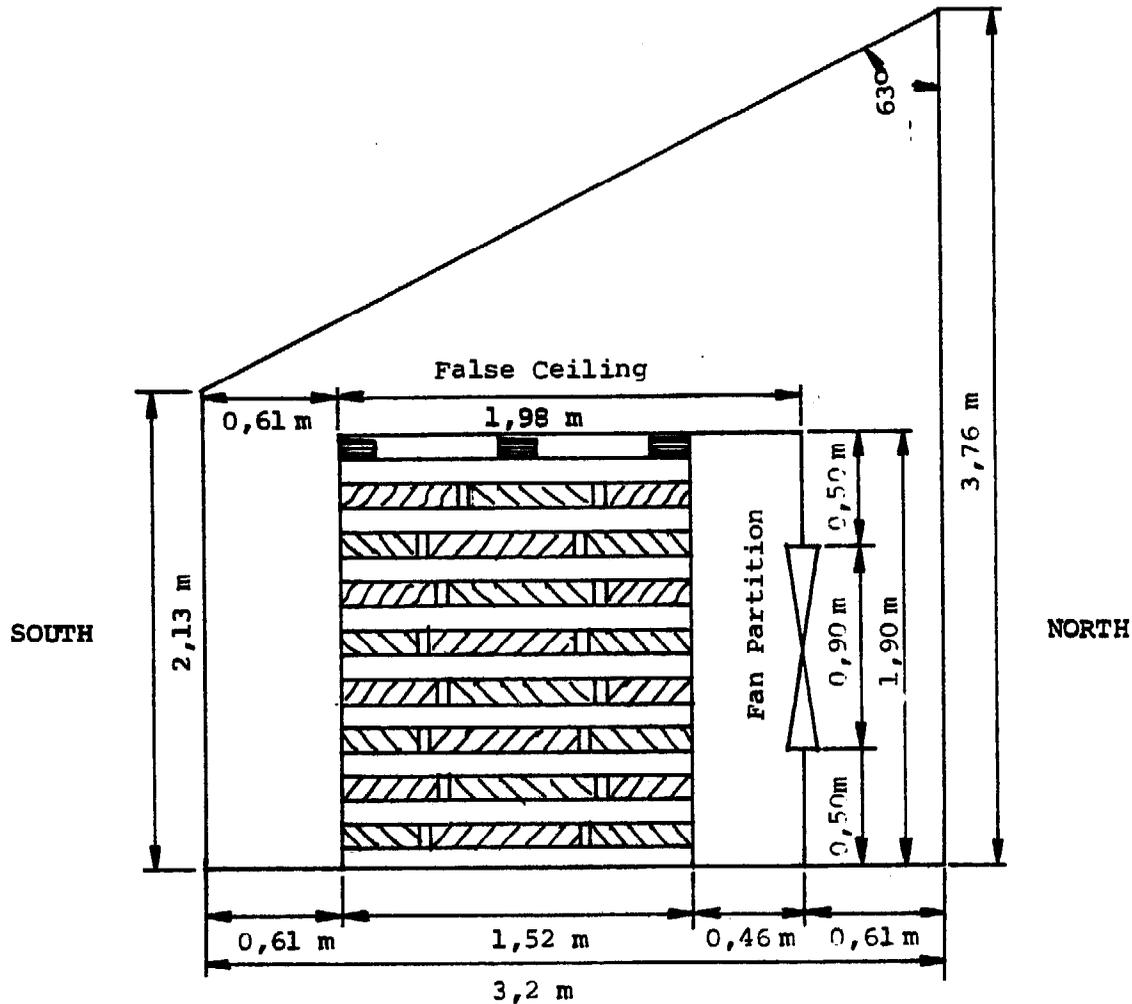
Plan of the Solar Timber Seasoning Kiln - Side View
